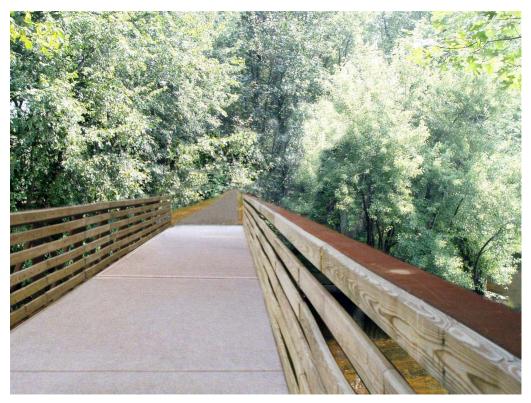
Alternative 4 - Concrete Deck Bridge on Steel Stringers
